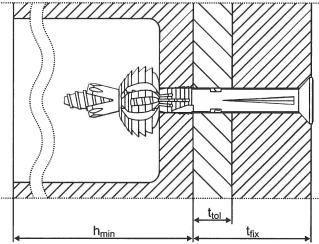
Installed anchor in hollow concrete units (h<sub>nom</sub> 70 mm, < of the dimension of the hole)
